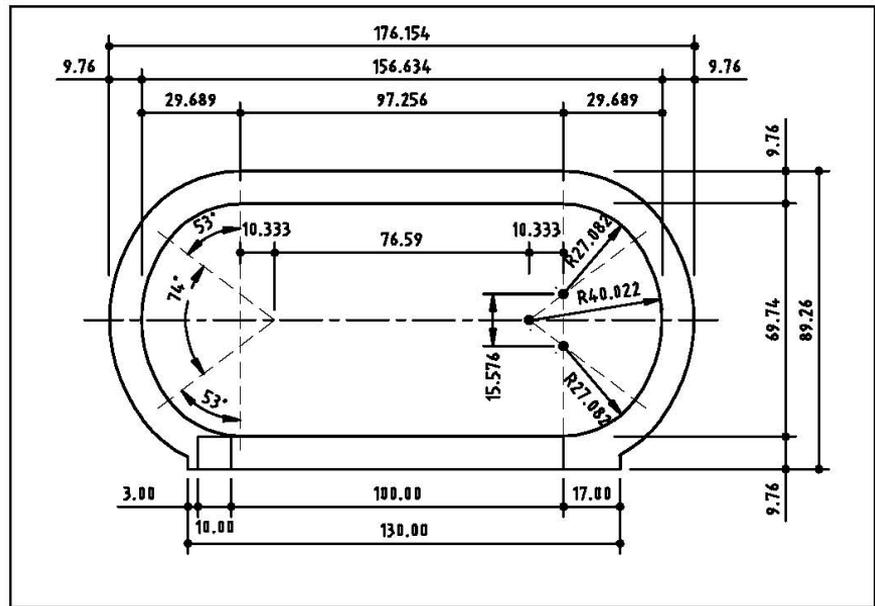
Shape and dimensions of 400m Double Bend Track (Radil 40.022m and 27.082m)
